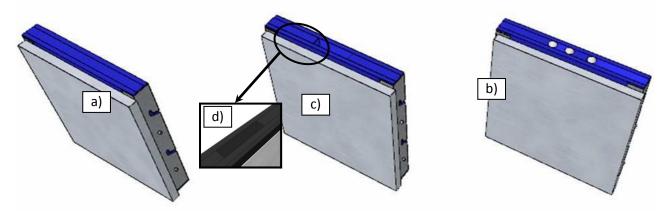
Original design of the prefabricated retrofit module – a) without ducts or cables; b) with moulded ducts; c) with ducts and cables cavities
